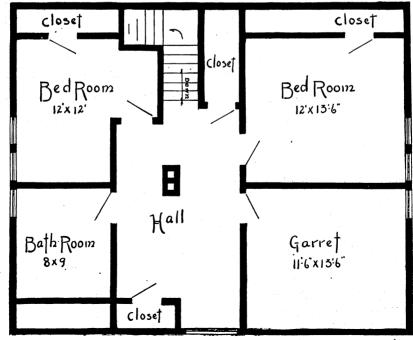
Second floor of \$1,000 house. (Design No. 2.)
